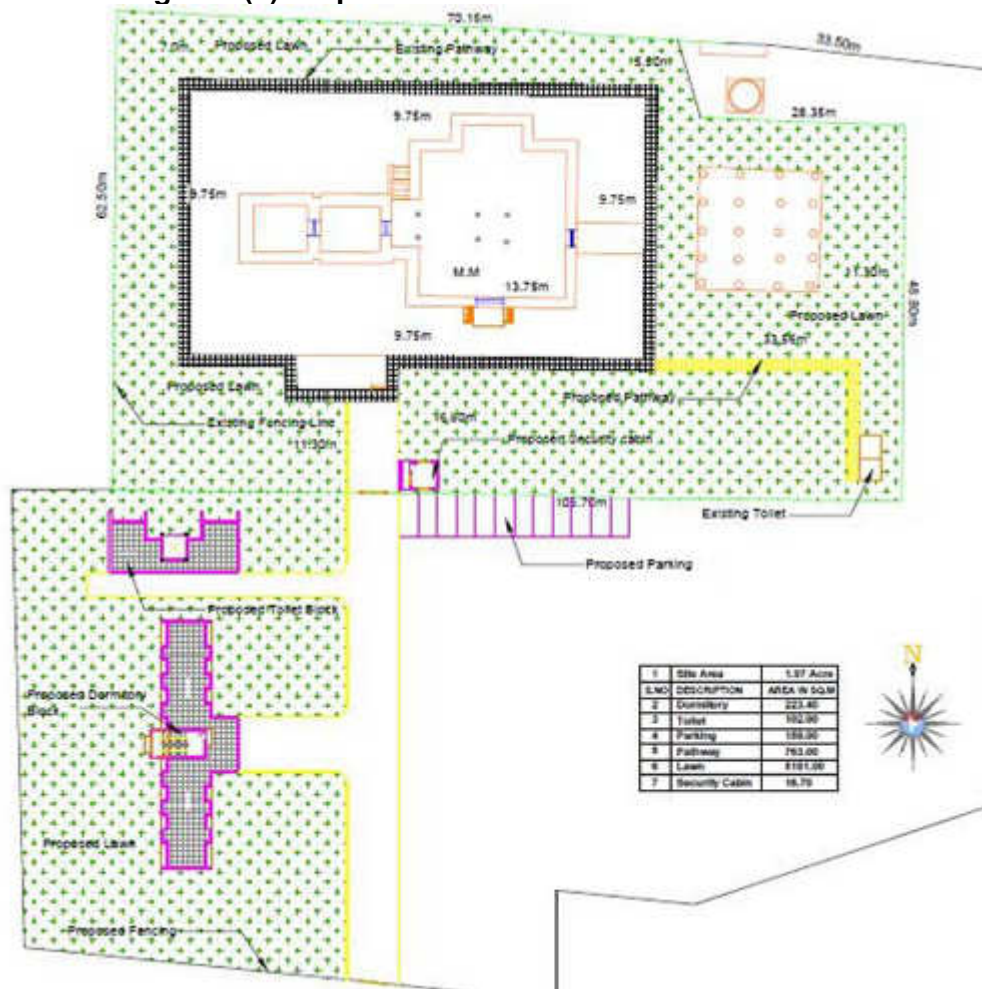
(e) Proposed site plan for subproject components – Koolamandal
